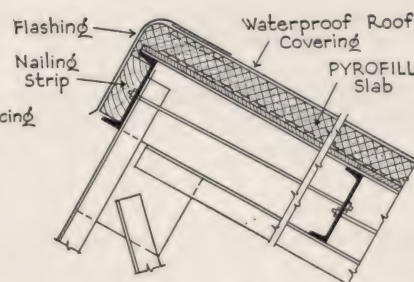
DETAILS OF SHEETROCK-PIROFILL SYSTEM
